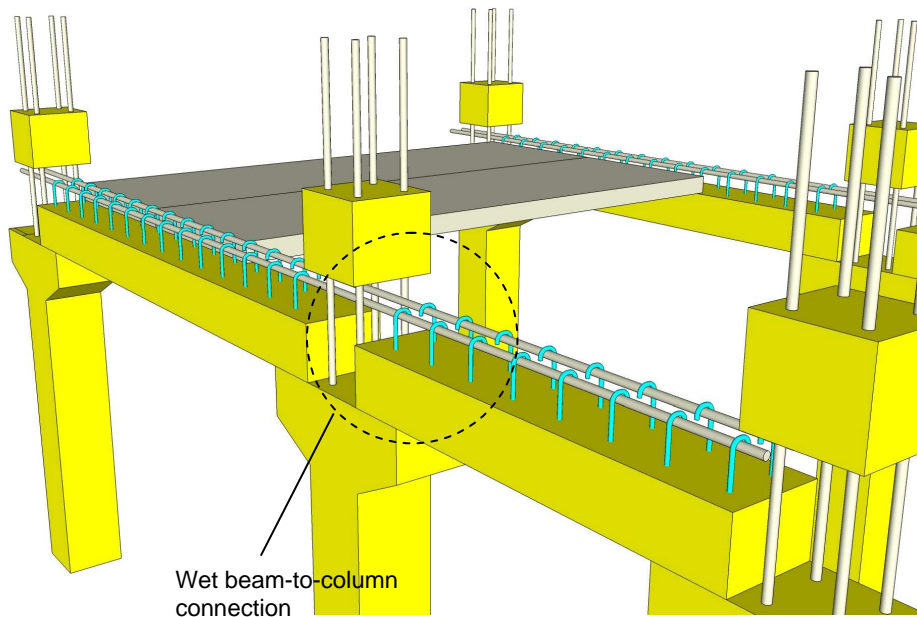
Beam-to-column connection using cast-in-place infill in precast concrete construction
